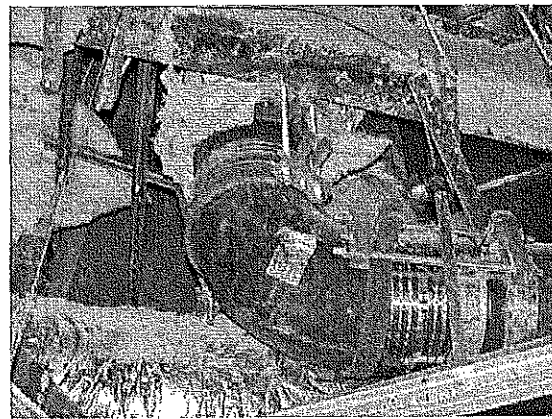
Post Failure Temporary Repairs at Point of Failure Illustrating New Code Compliant Joint Restraints and Couplings (Noted by Arrows)
